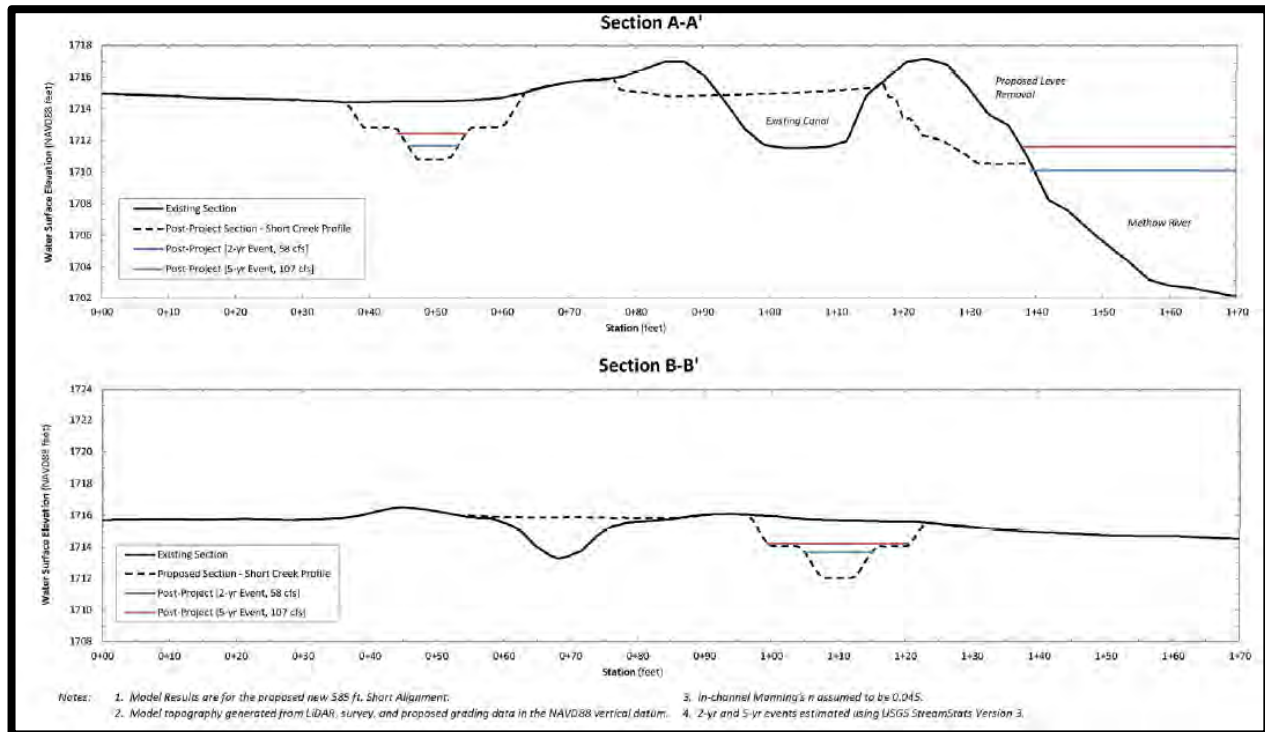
Section views of existing grade compared to the proposed Bear Creek Alignment.
